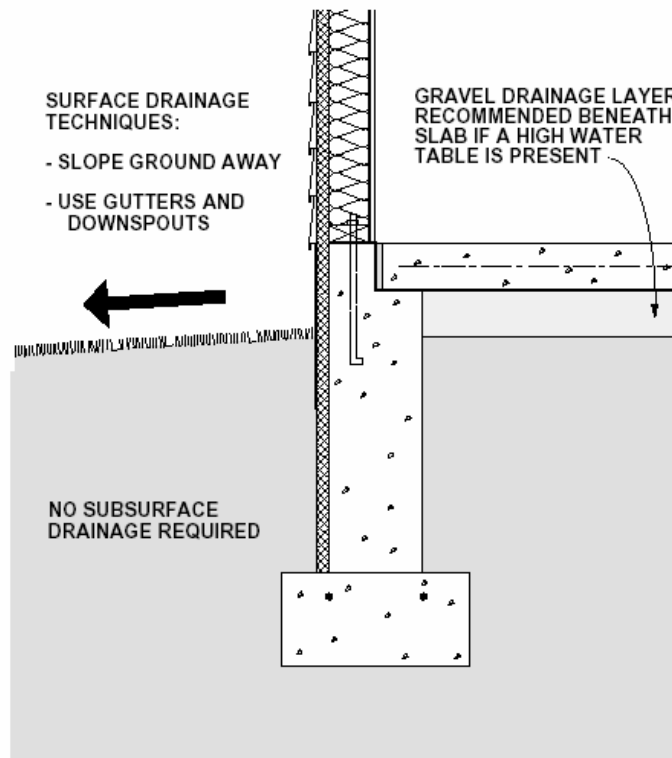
Drainage Techniques for Slab-on-Grade Foundations
